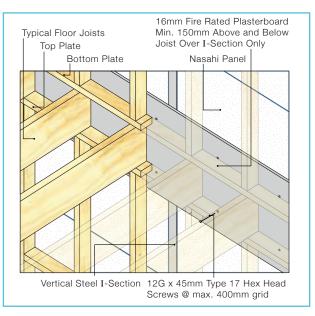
90 Minute FRL Solution - 16mm fire rated plasterboard installation in the floor joist zone and in the roof space zone.
